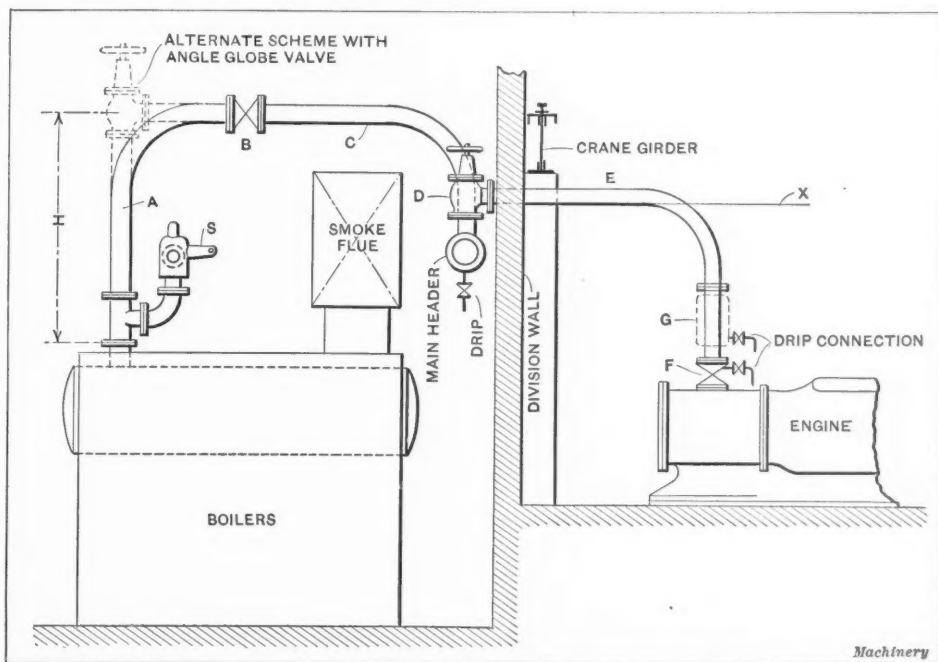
Improved Arrangement of Piping for the Same Installation as shown in Fig. 6
